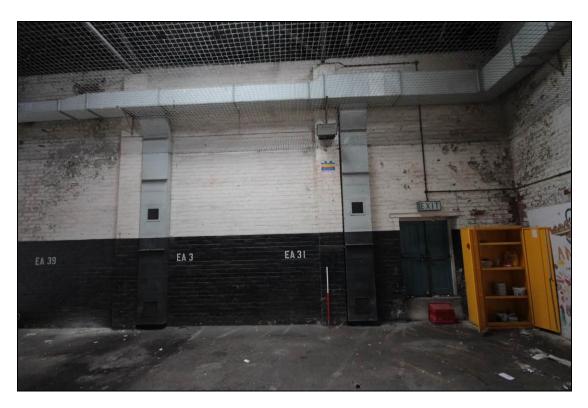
The eastern end of the north western internal wall, facing north west. Scale 1m.
